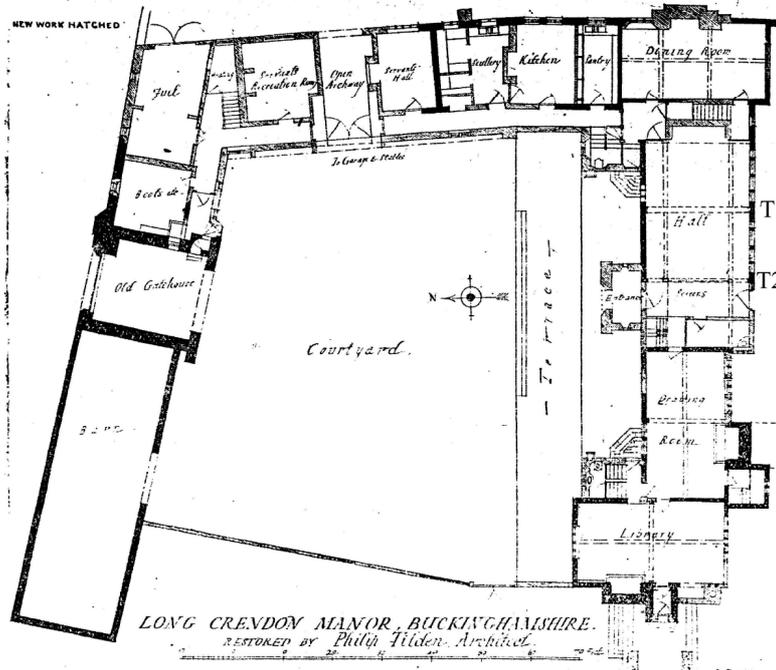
Plan in 1921. The positions of trusses T1 and T2 have been marked. (*Building News*)
